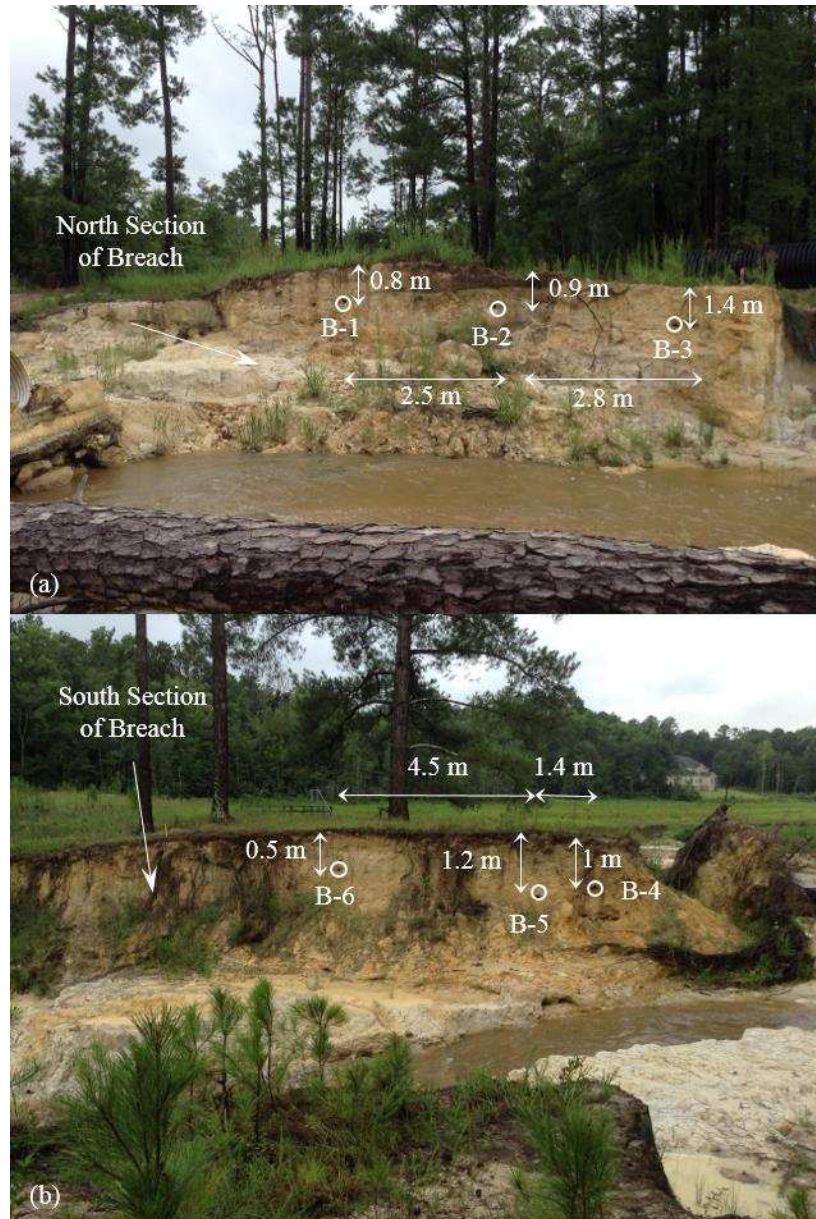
Sampling locations for Dam B, (a) north wall of breach section (north view from crest), and (b) south wall of breach section (south view from crest).
